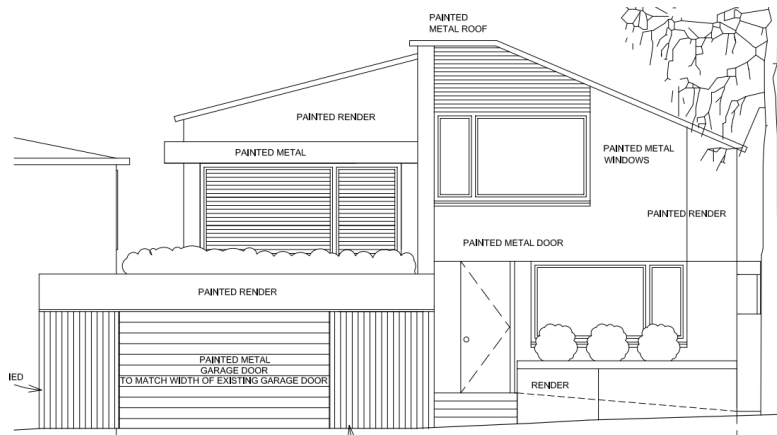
Extract of proposed front elevation approved under ref: 2013/3998/P
